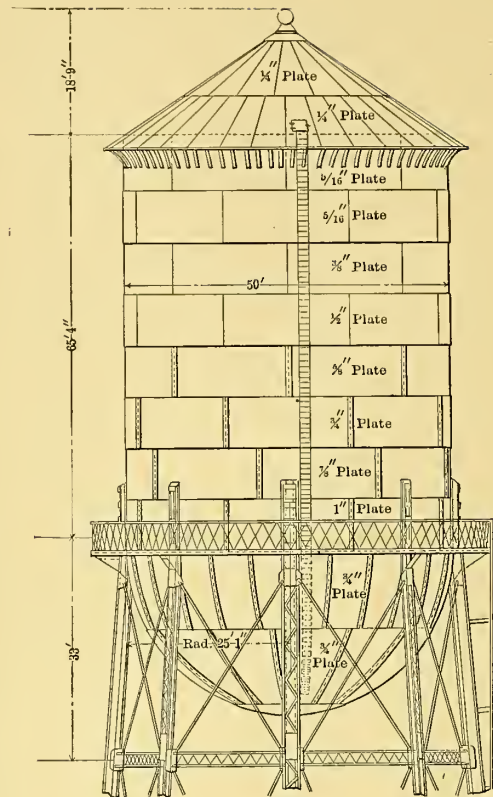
OUTLINE OF THE TANK, SHOWING PRINCIPAL DIMENSIONS.
